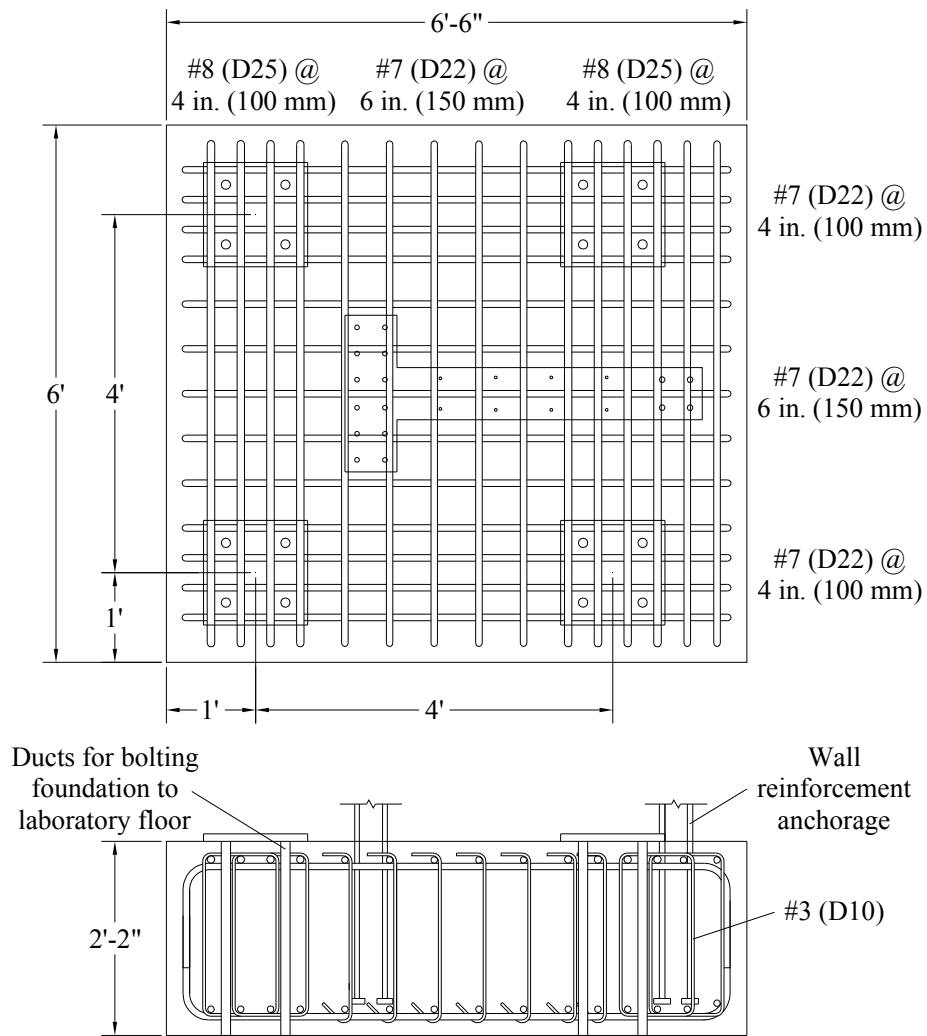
Typical reinforcement for wall foundations (transverse wall reinforcement not shown for clarity)
